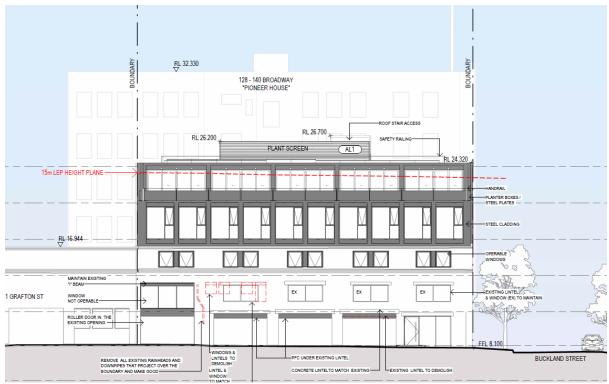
South (Grafton Street) Elevation demonstrating building height in context of the 1 Grafton Street Chippendale (adjoining building) and Pioneer House in the background
